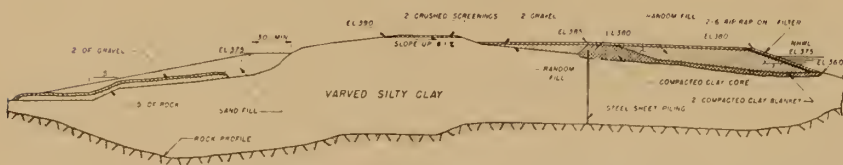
Developed section through earth dam, Peribonka No. 2 development.
